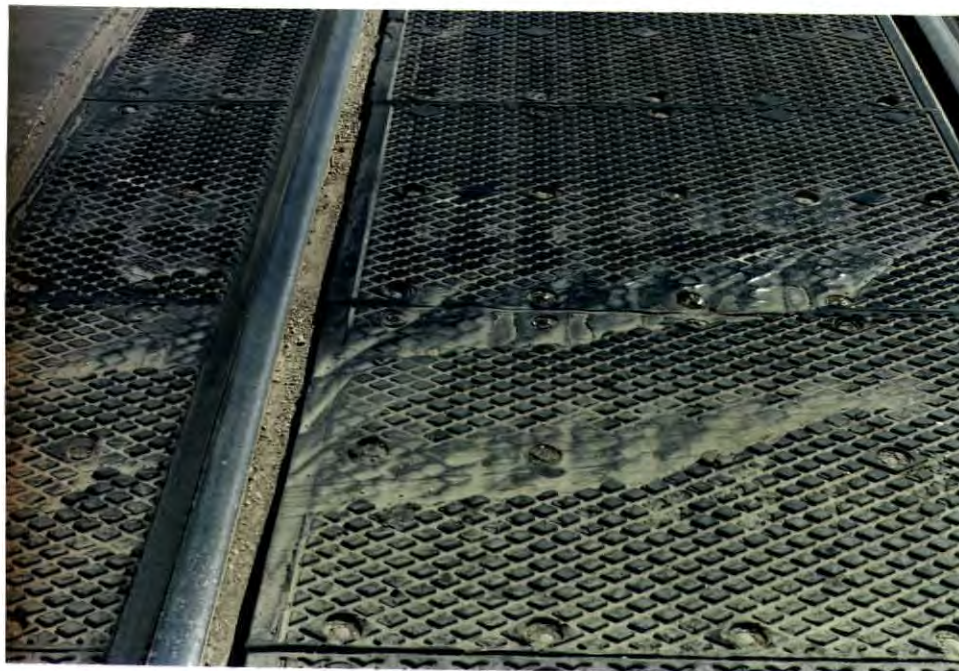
Mt. View Road - Panel Wear and Snow Plow Damage
